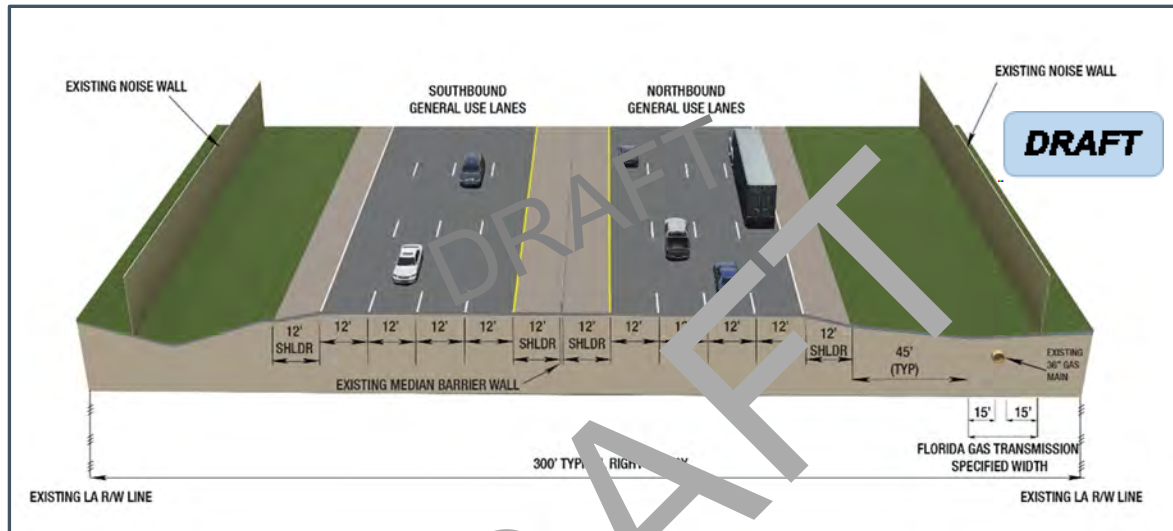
Existing Typical Section (I-595 to Atlantic Boulevard)
